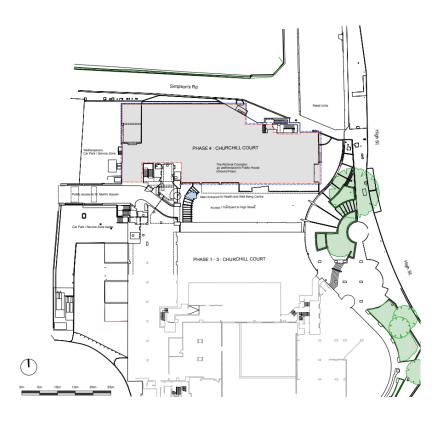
Ravensleigh House/Phase 4 Churchill Court (shaded area)
